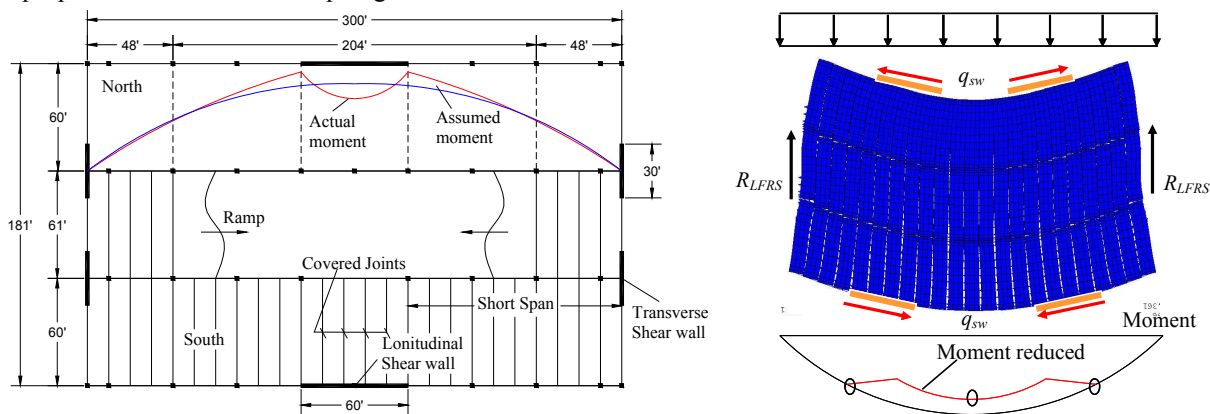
Plan for a 4-story parking garage with perimeter shear walls.
